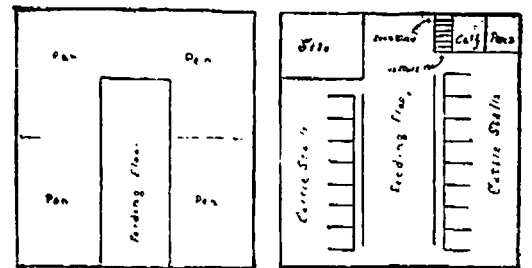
FLOOR PLAN FOR SHEEP BARN. FIG. 3. FLOOR PLAN FOR DAIRY BARN.
